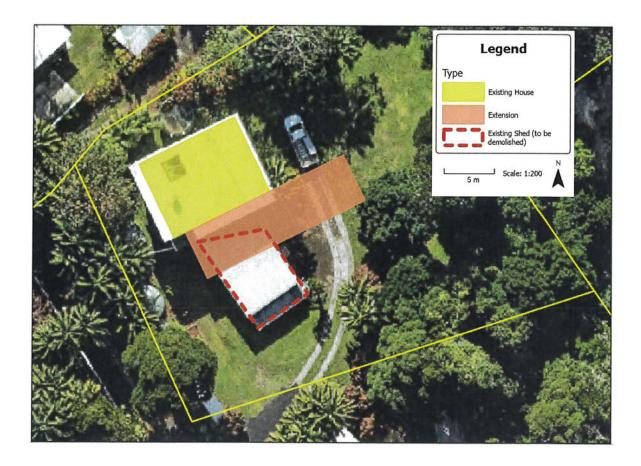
Location of proposed building footprint in relation to existing built structures on the lot.
